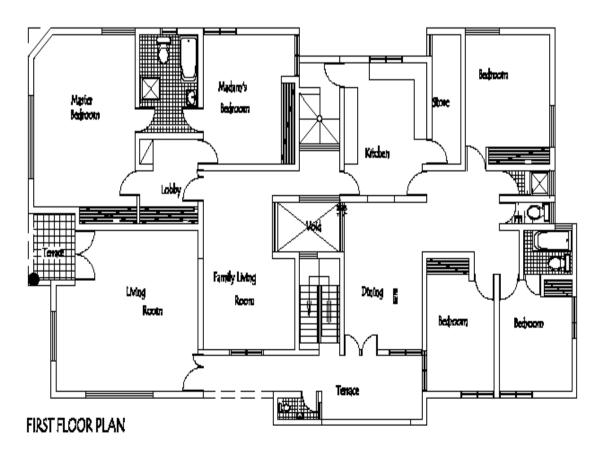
First Floor Plan of a Typical Block of Flat
